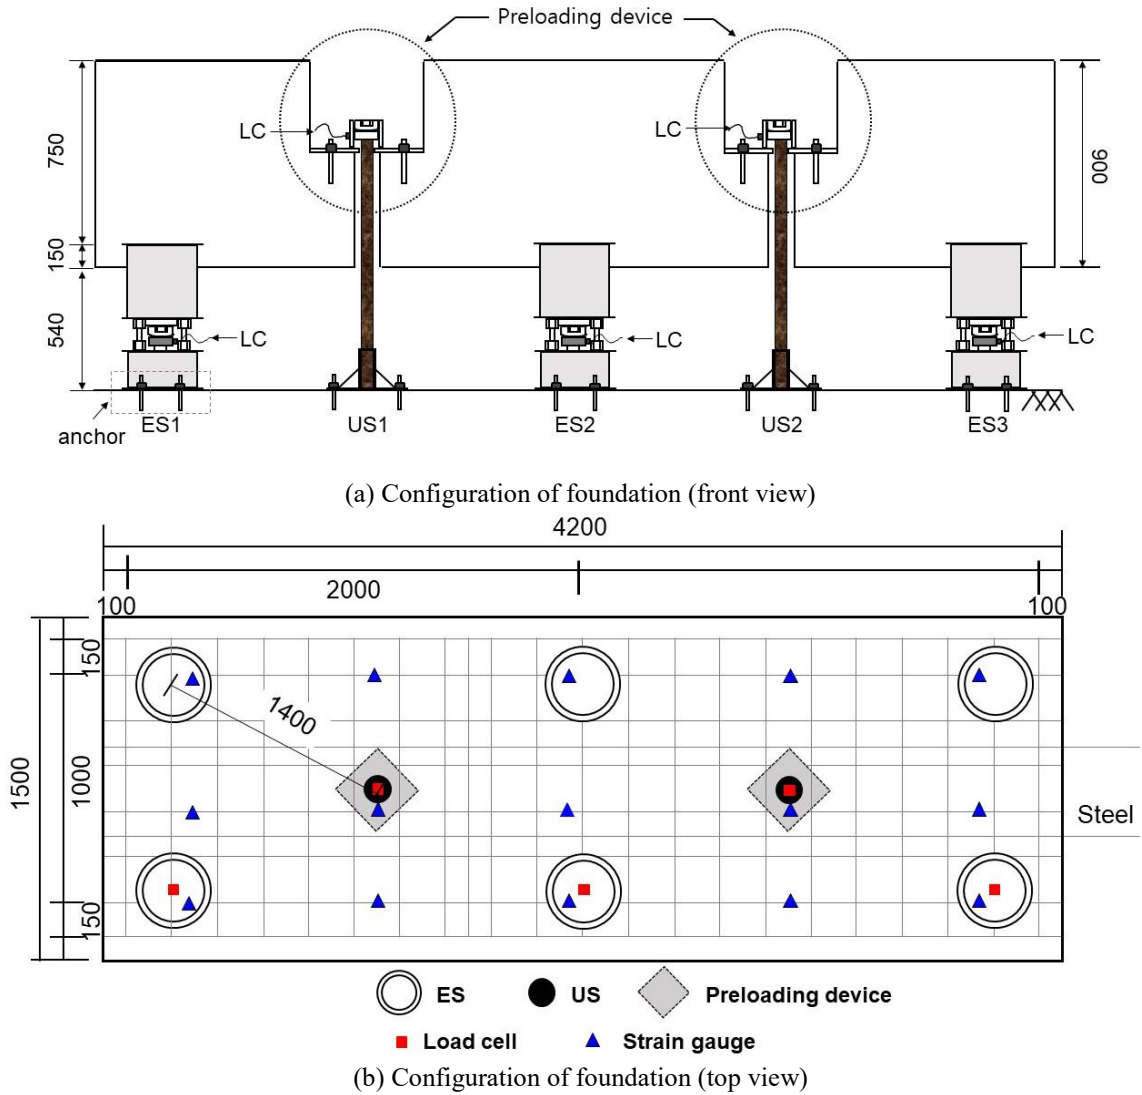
Layout of full-scale foundation model (not to scale, unit: mm)
